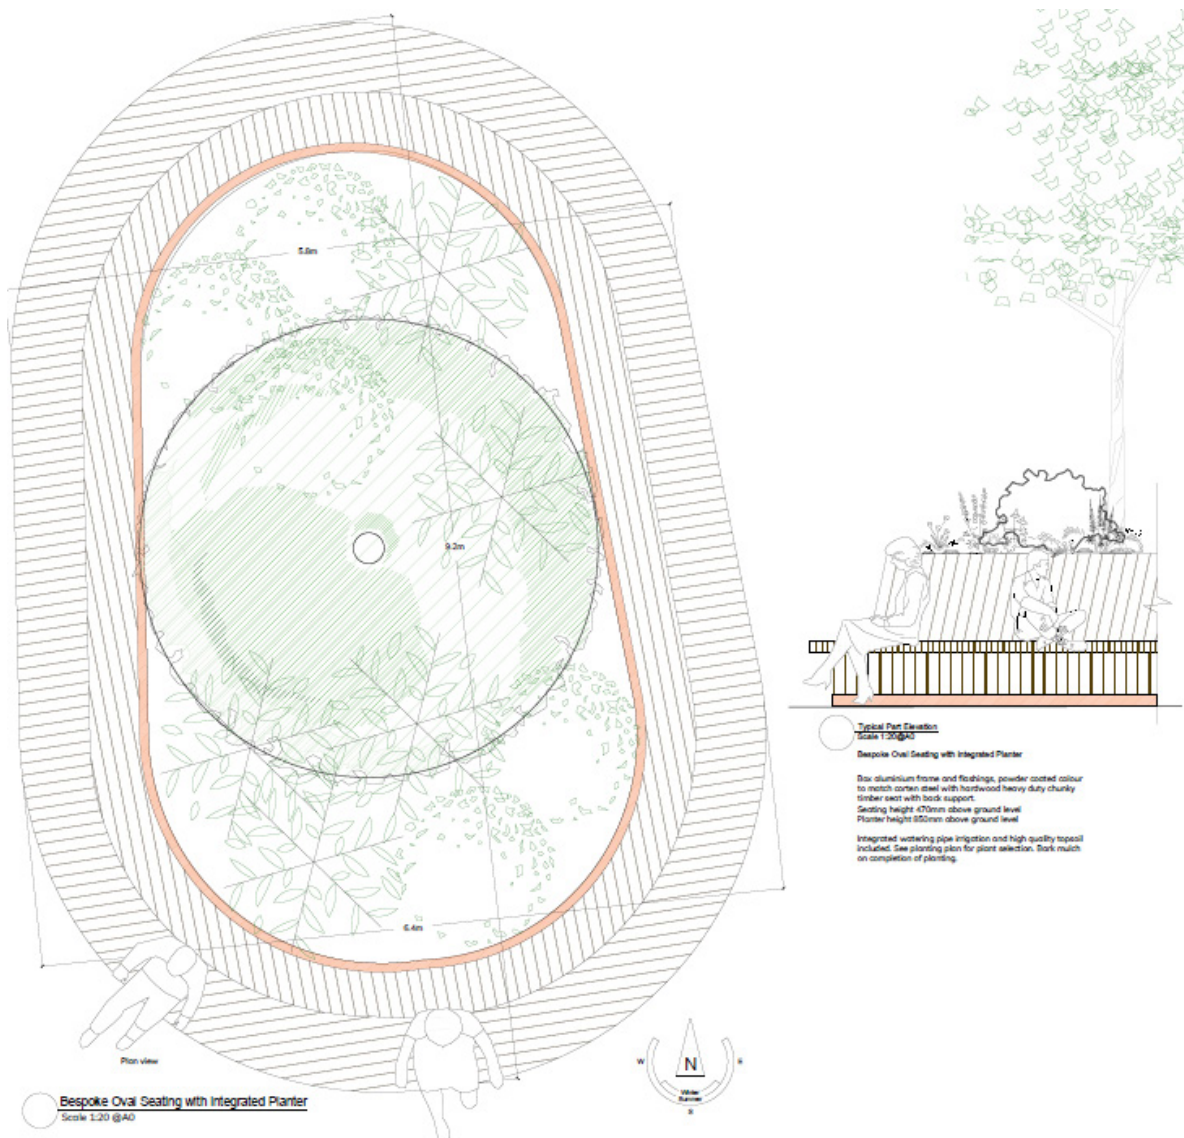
Detail of Hard Landscape Details for bespoke oval seating with integrated planter proposed Site Layout Plan of Kingston Park (Drawing P612-KIN-LD-HL-303)
